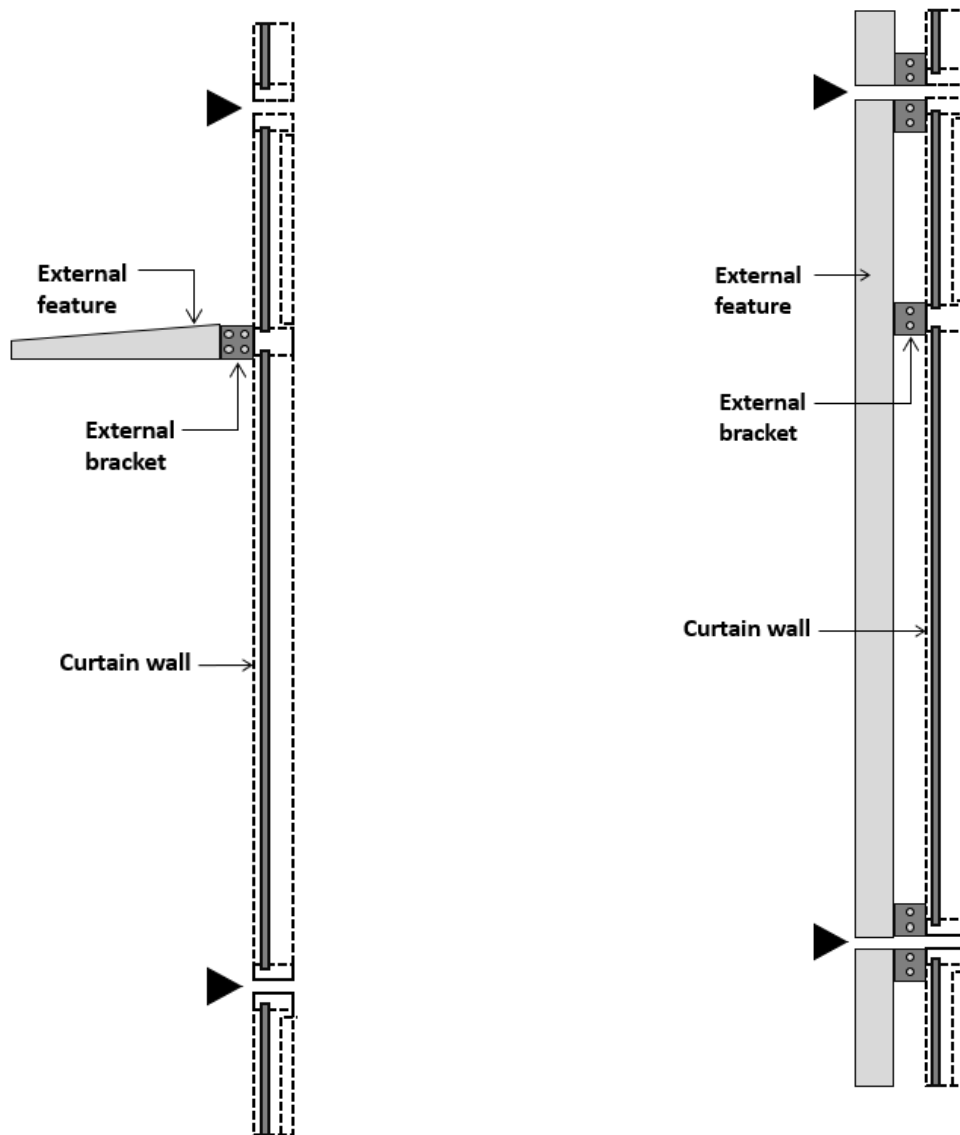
Example – section drawing (detail) on left and right illustration connection between curtain wall and metal external feature on the exposed face of the façade. Providing metals of similar metal properties or separator/isolator helps to mitigate risk of bi-metallic corrosion.
